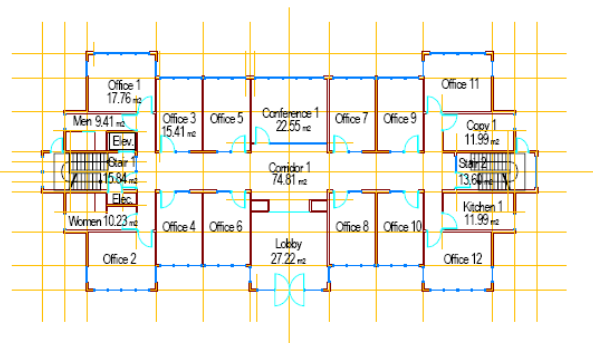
Geometry of the ground floor of an office building, as depicted in a typical architectural CAD tool.
